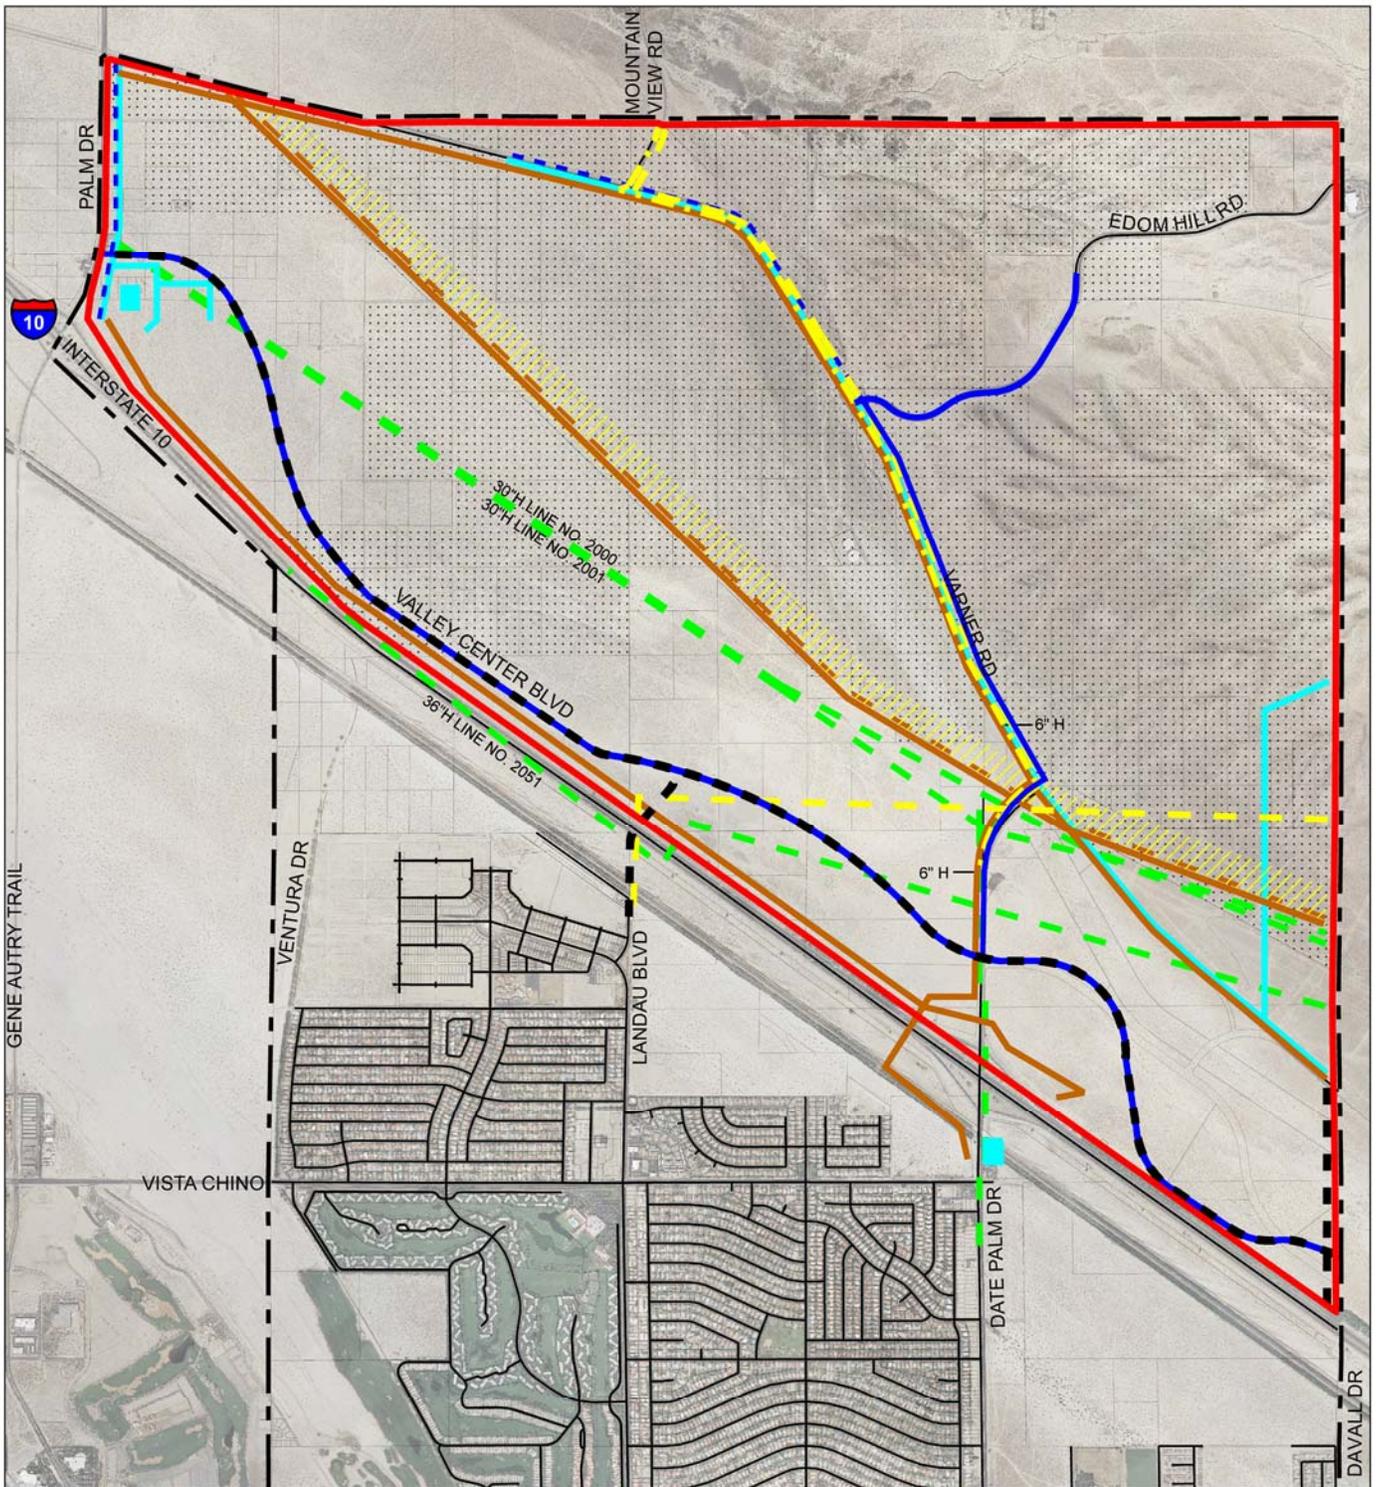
Existing and Recommended Dry Utilities for the Specific Plan Area
